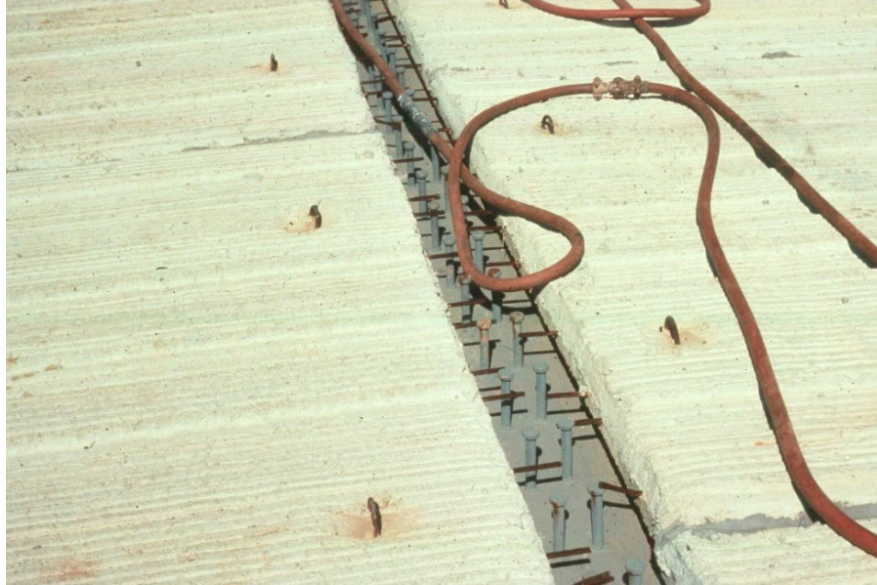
Precast Deck Panels with Lifting Lugs Evident and Top Beam Flange Exposed (Prior to CIP Topping)
